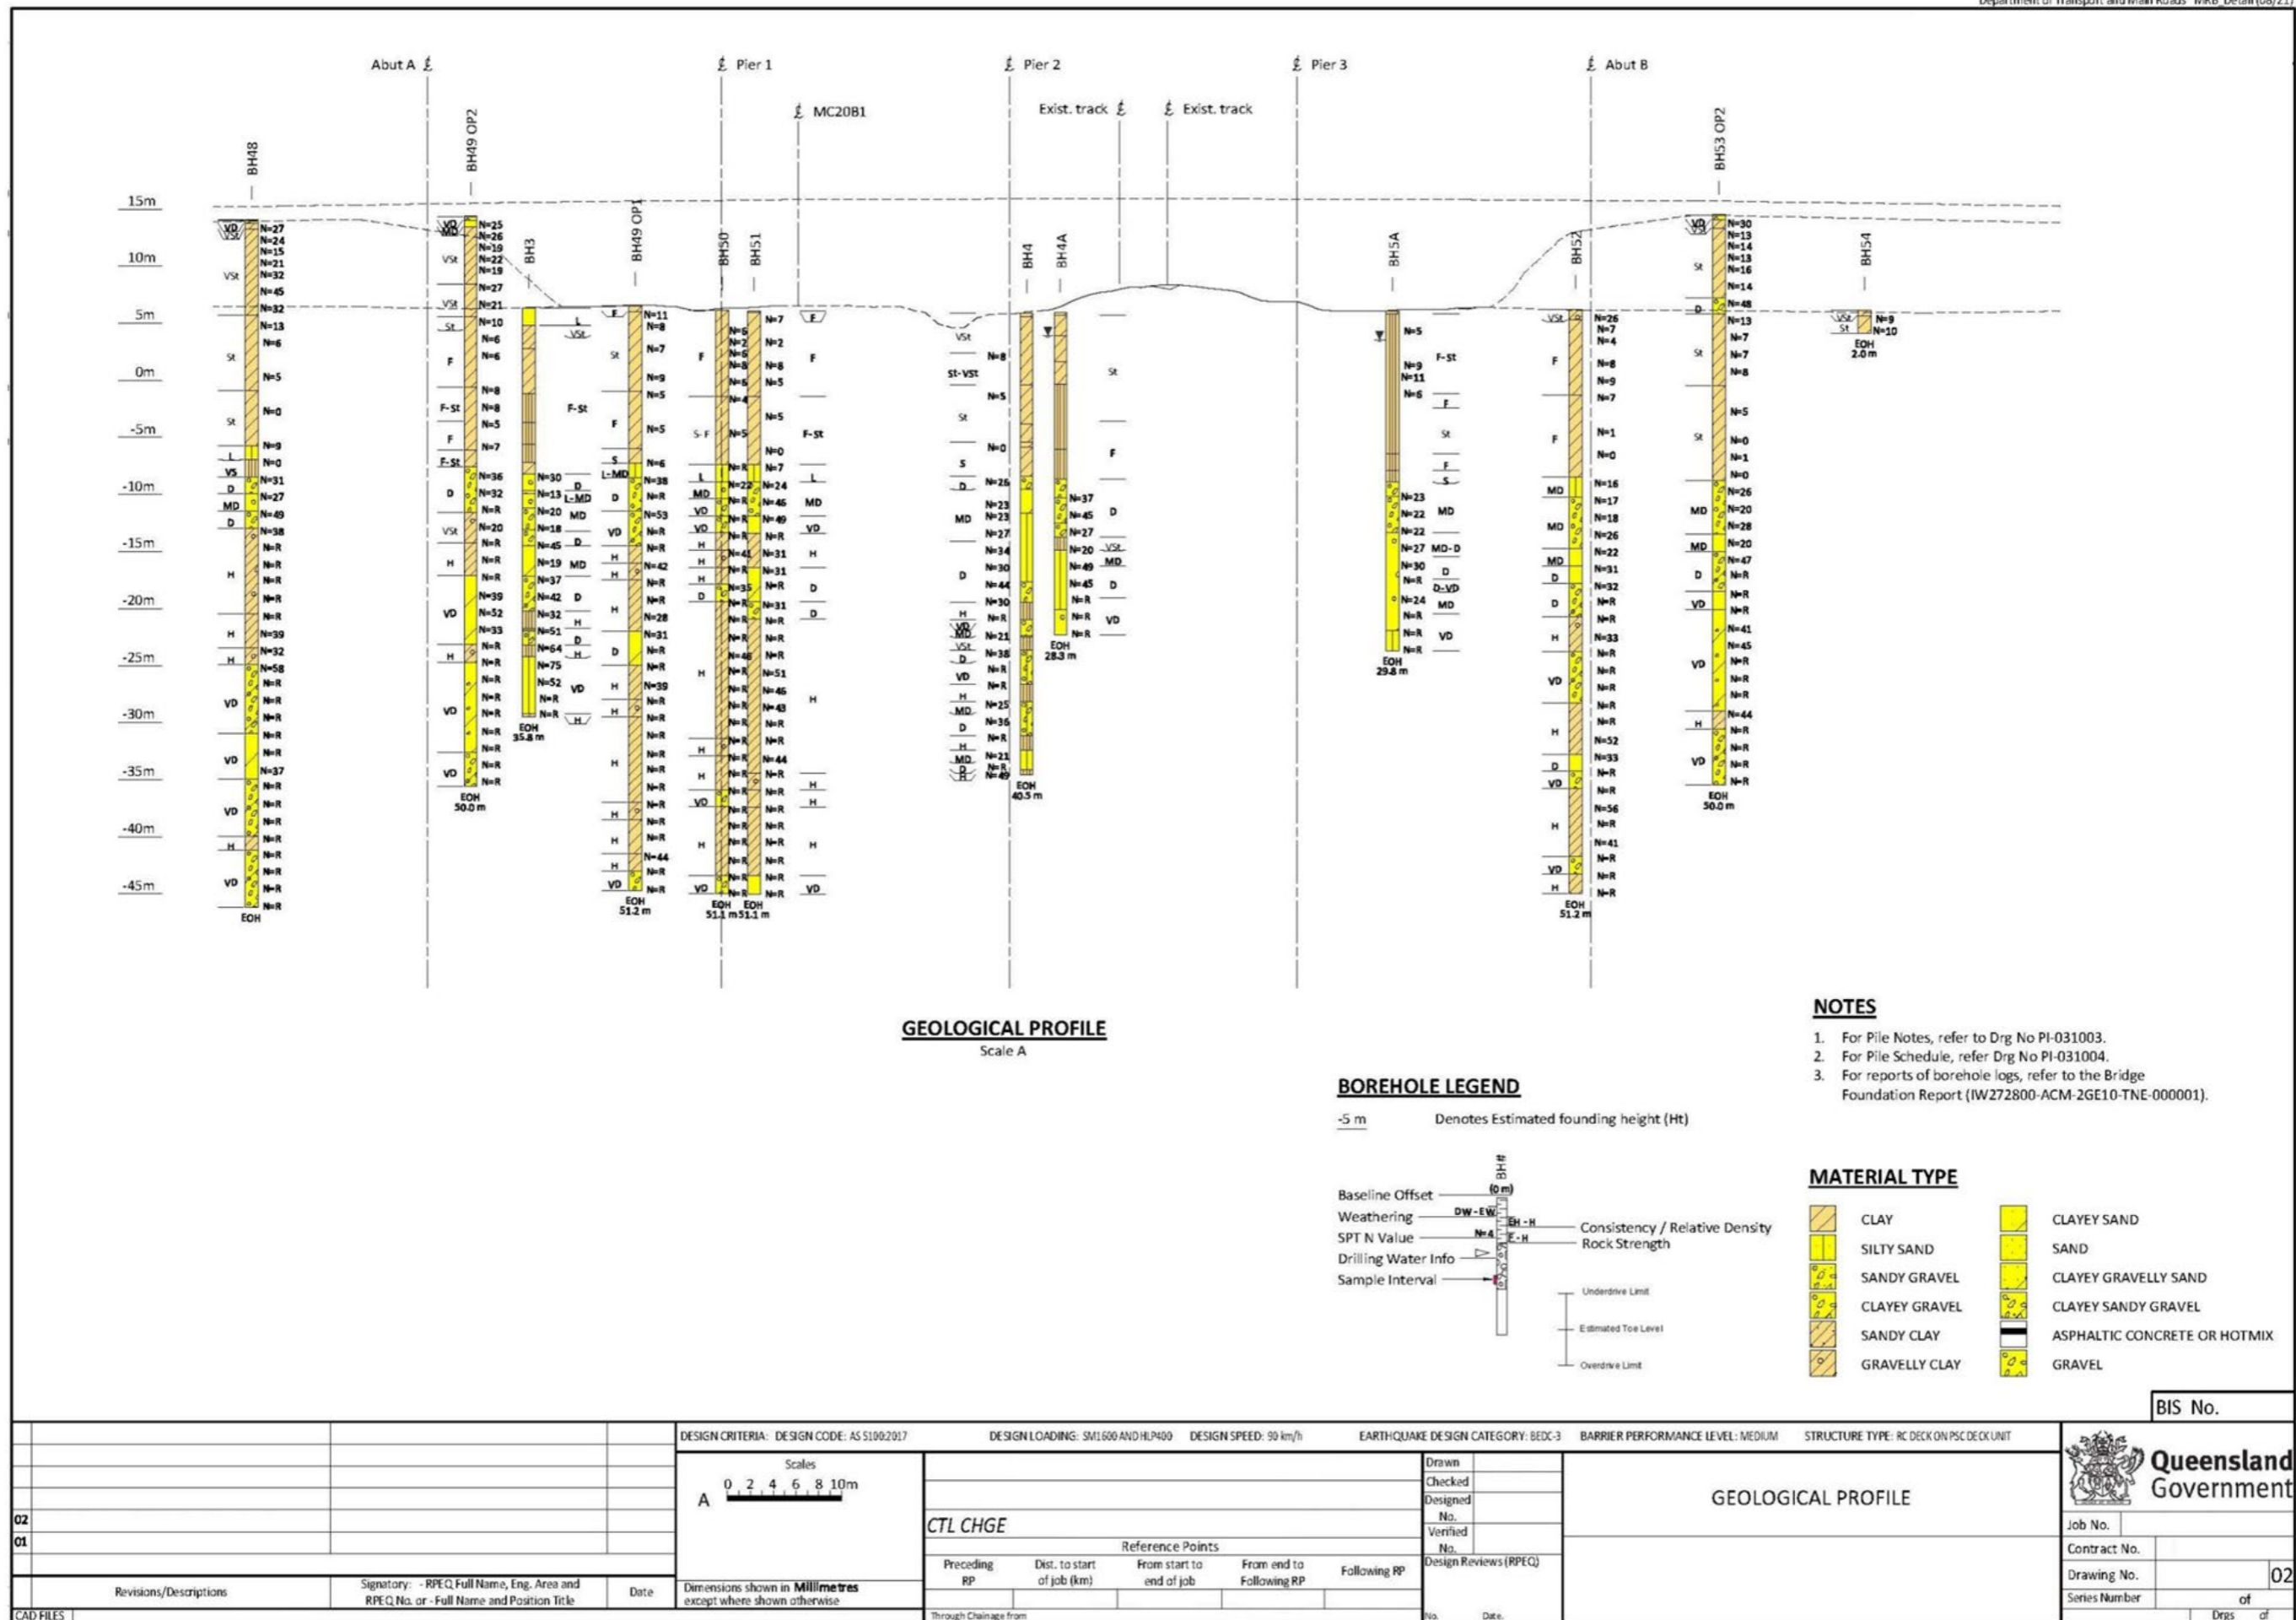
(a) - Example foundation layout geological profile drawing
